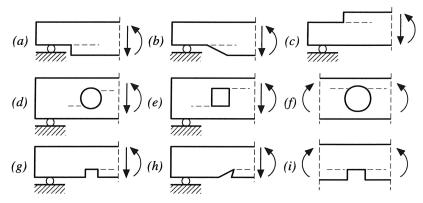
Notched beams and beams with a hole. Broken line indicates probable crack propagation path.
